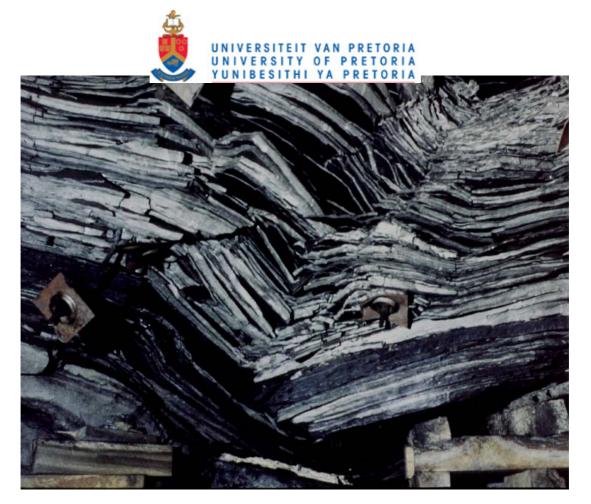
An example of roof-softening in a coal mine in the USA (courtesy of Dr. C. *Mark*)
